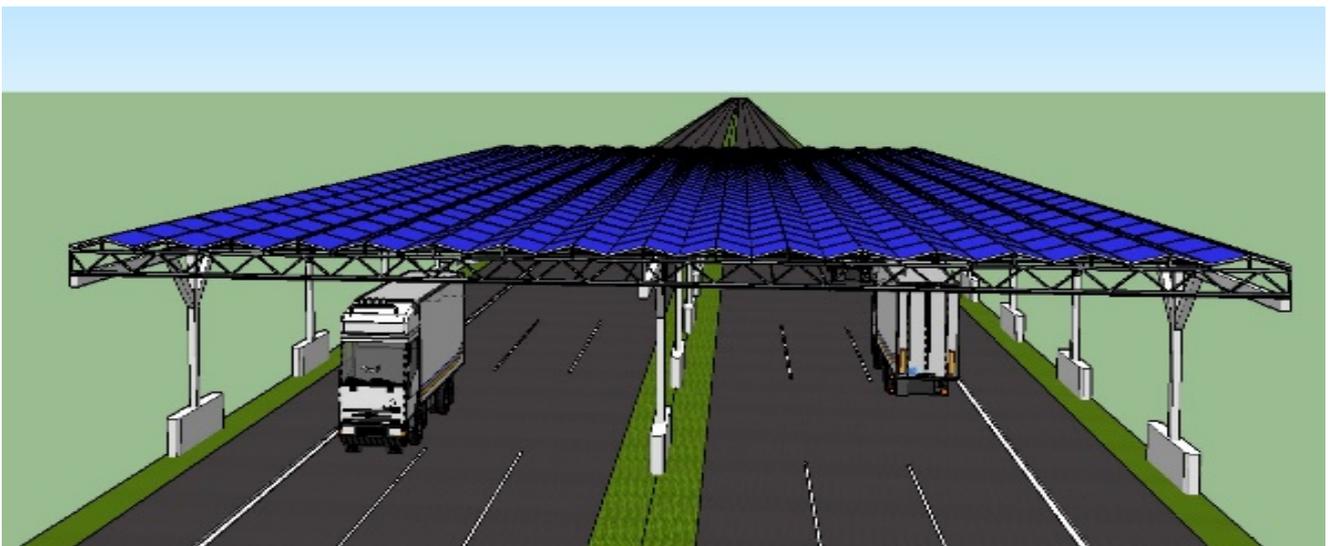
Artist impression of a retractable system over-arching existing roads. Source: iWorks AG.
